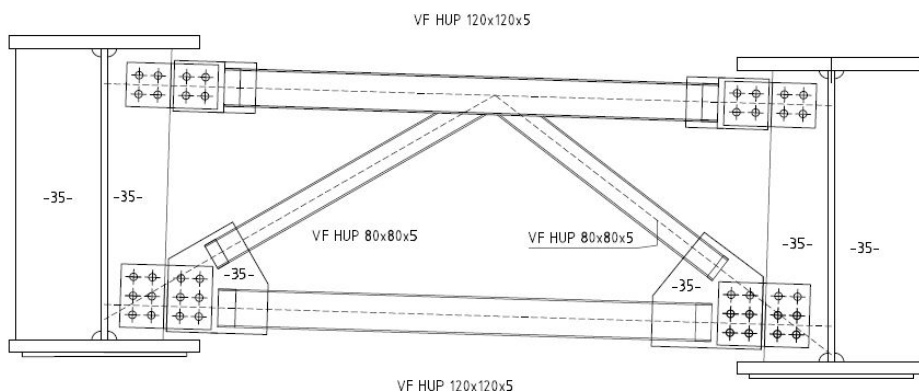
Cross section of the steel trusses and welding plates at column 2
